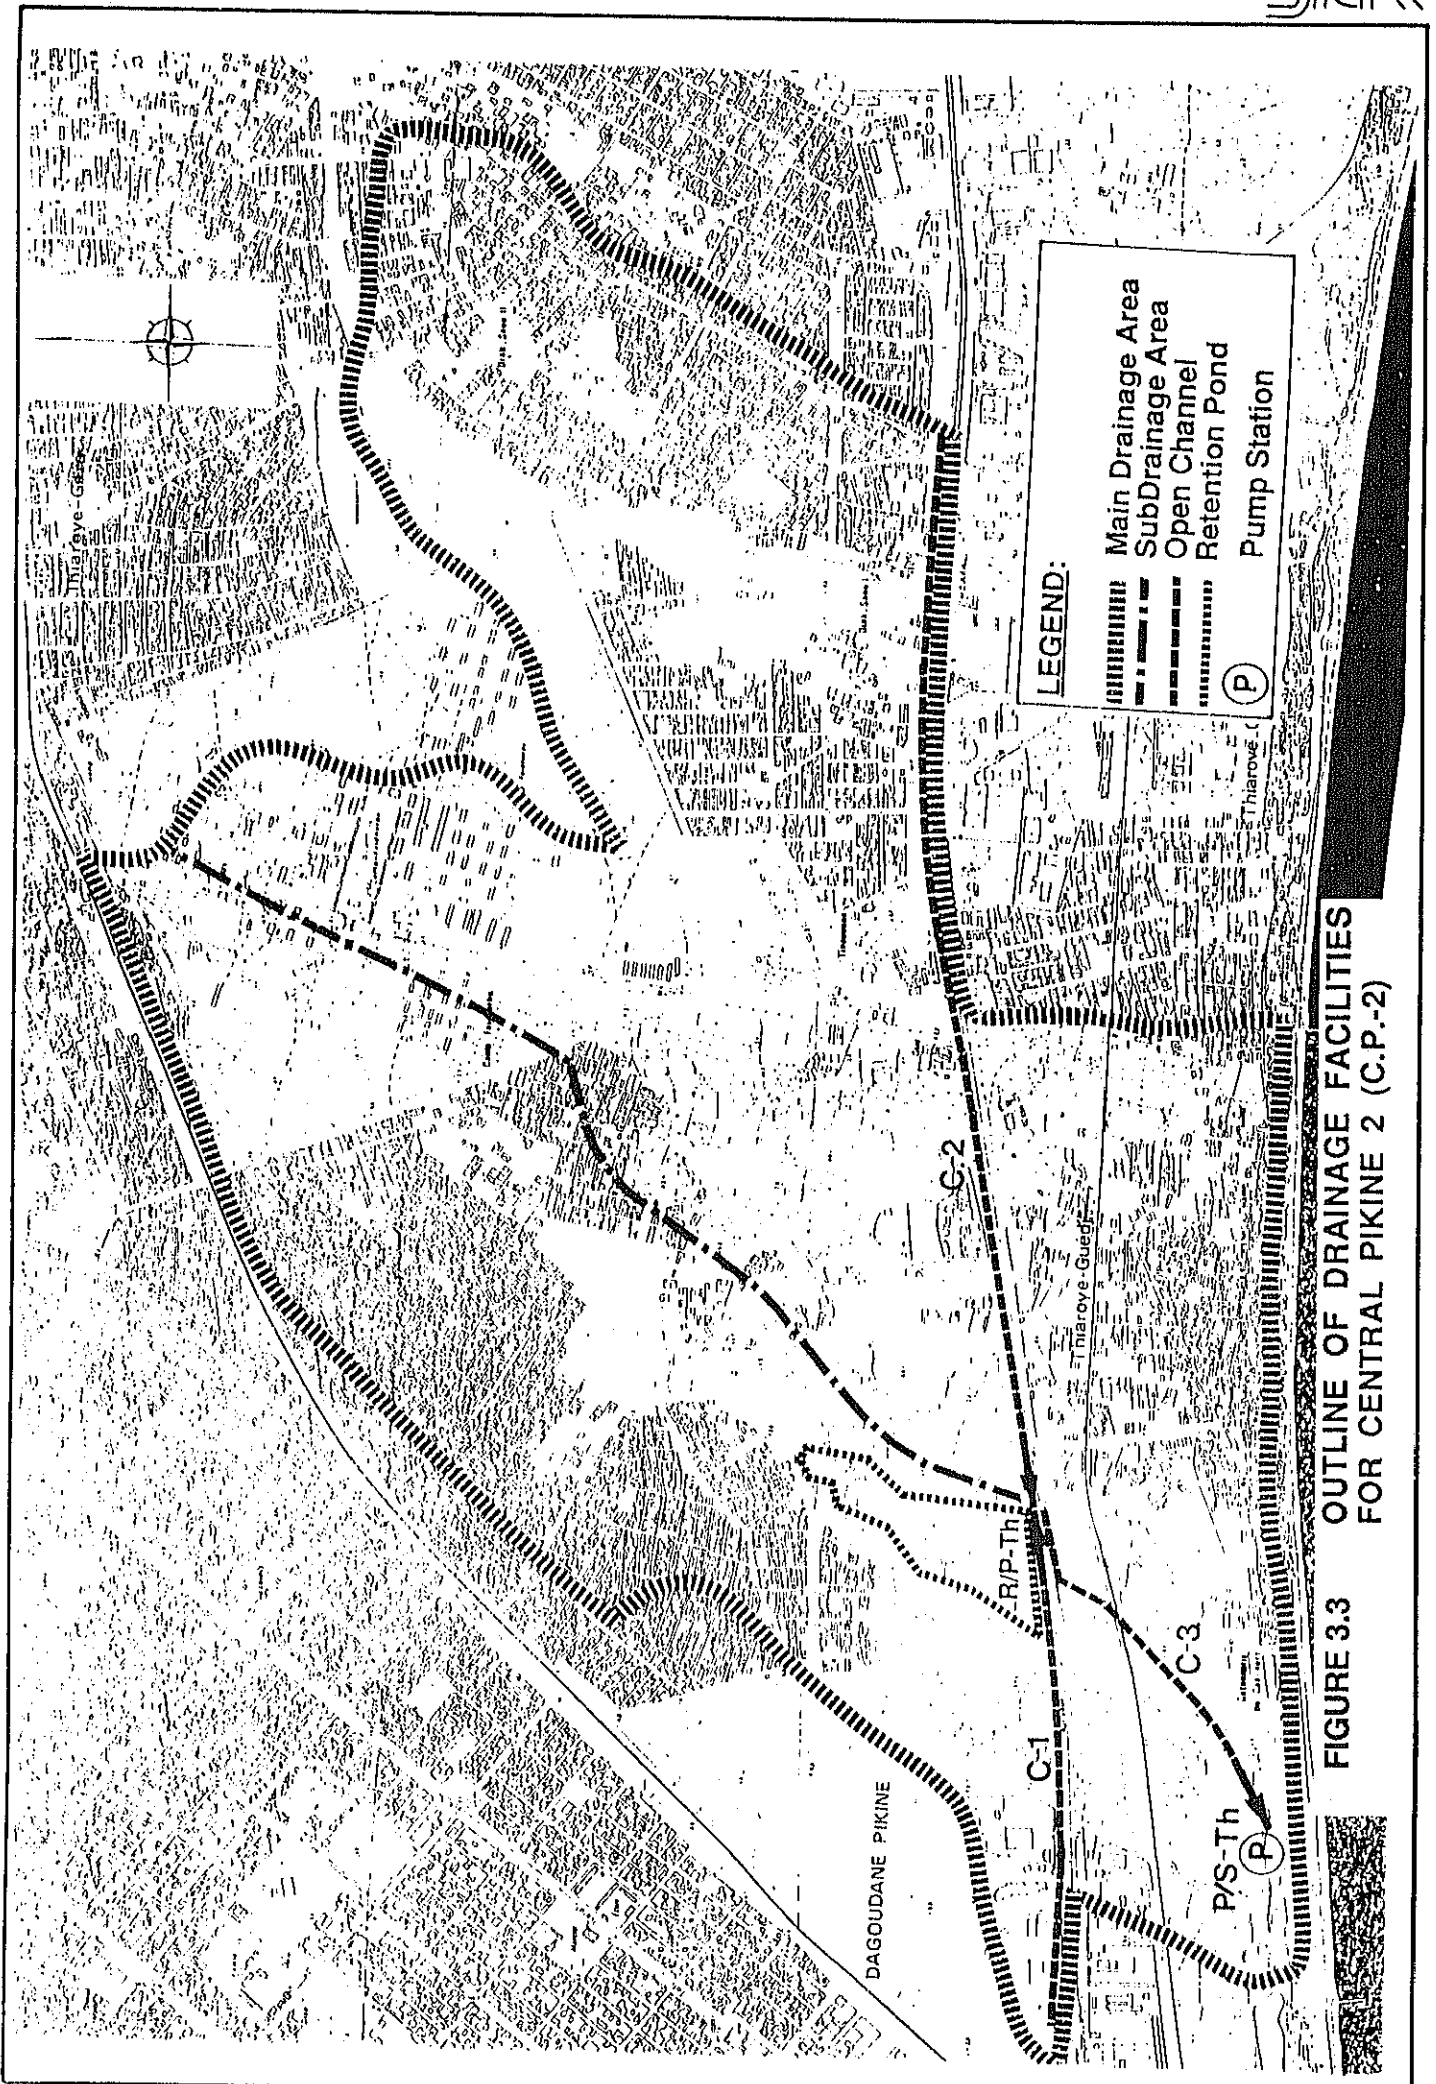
OUTLINE OF DRAINAGE FACILITIES FOR CENTRAL PIKINE 2 (C.P.-2)
